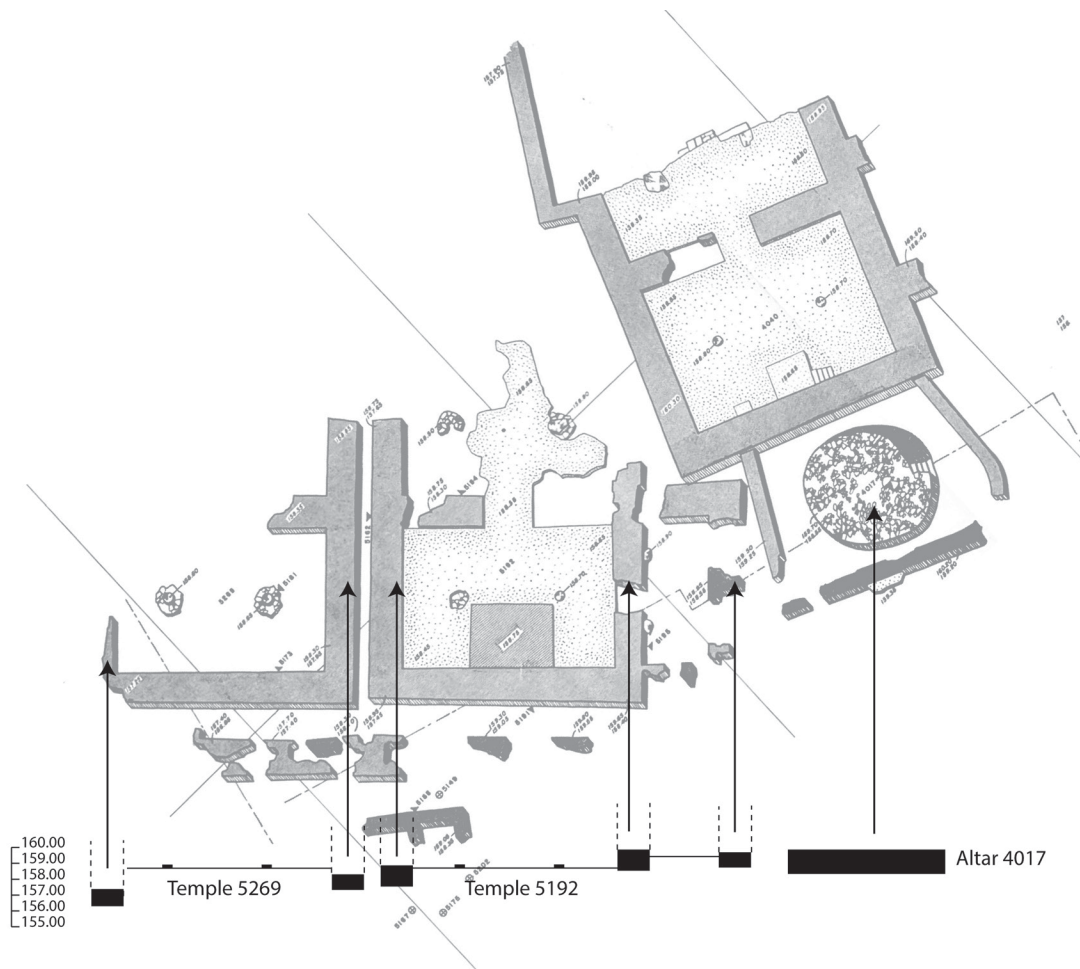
Plan and schematic section of the Triple Temple Complex looking north showing the dramatic east-west slope and the progressively deeper foundations required in that direction.
